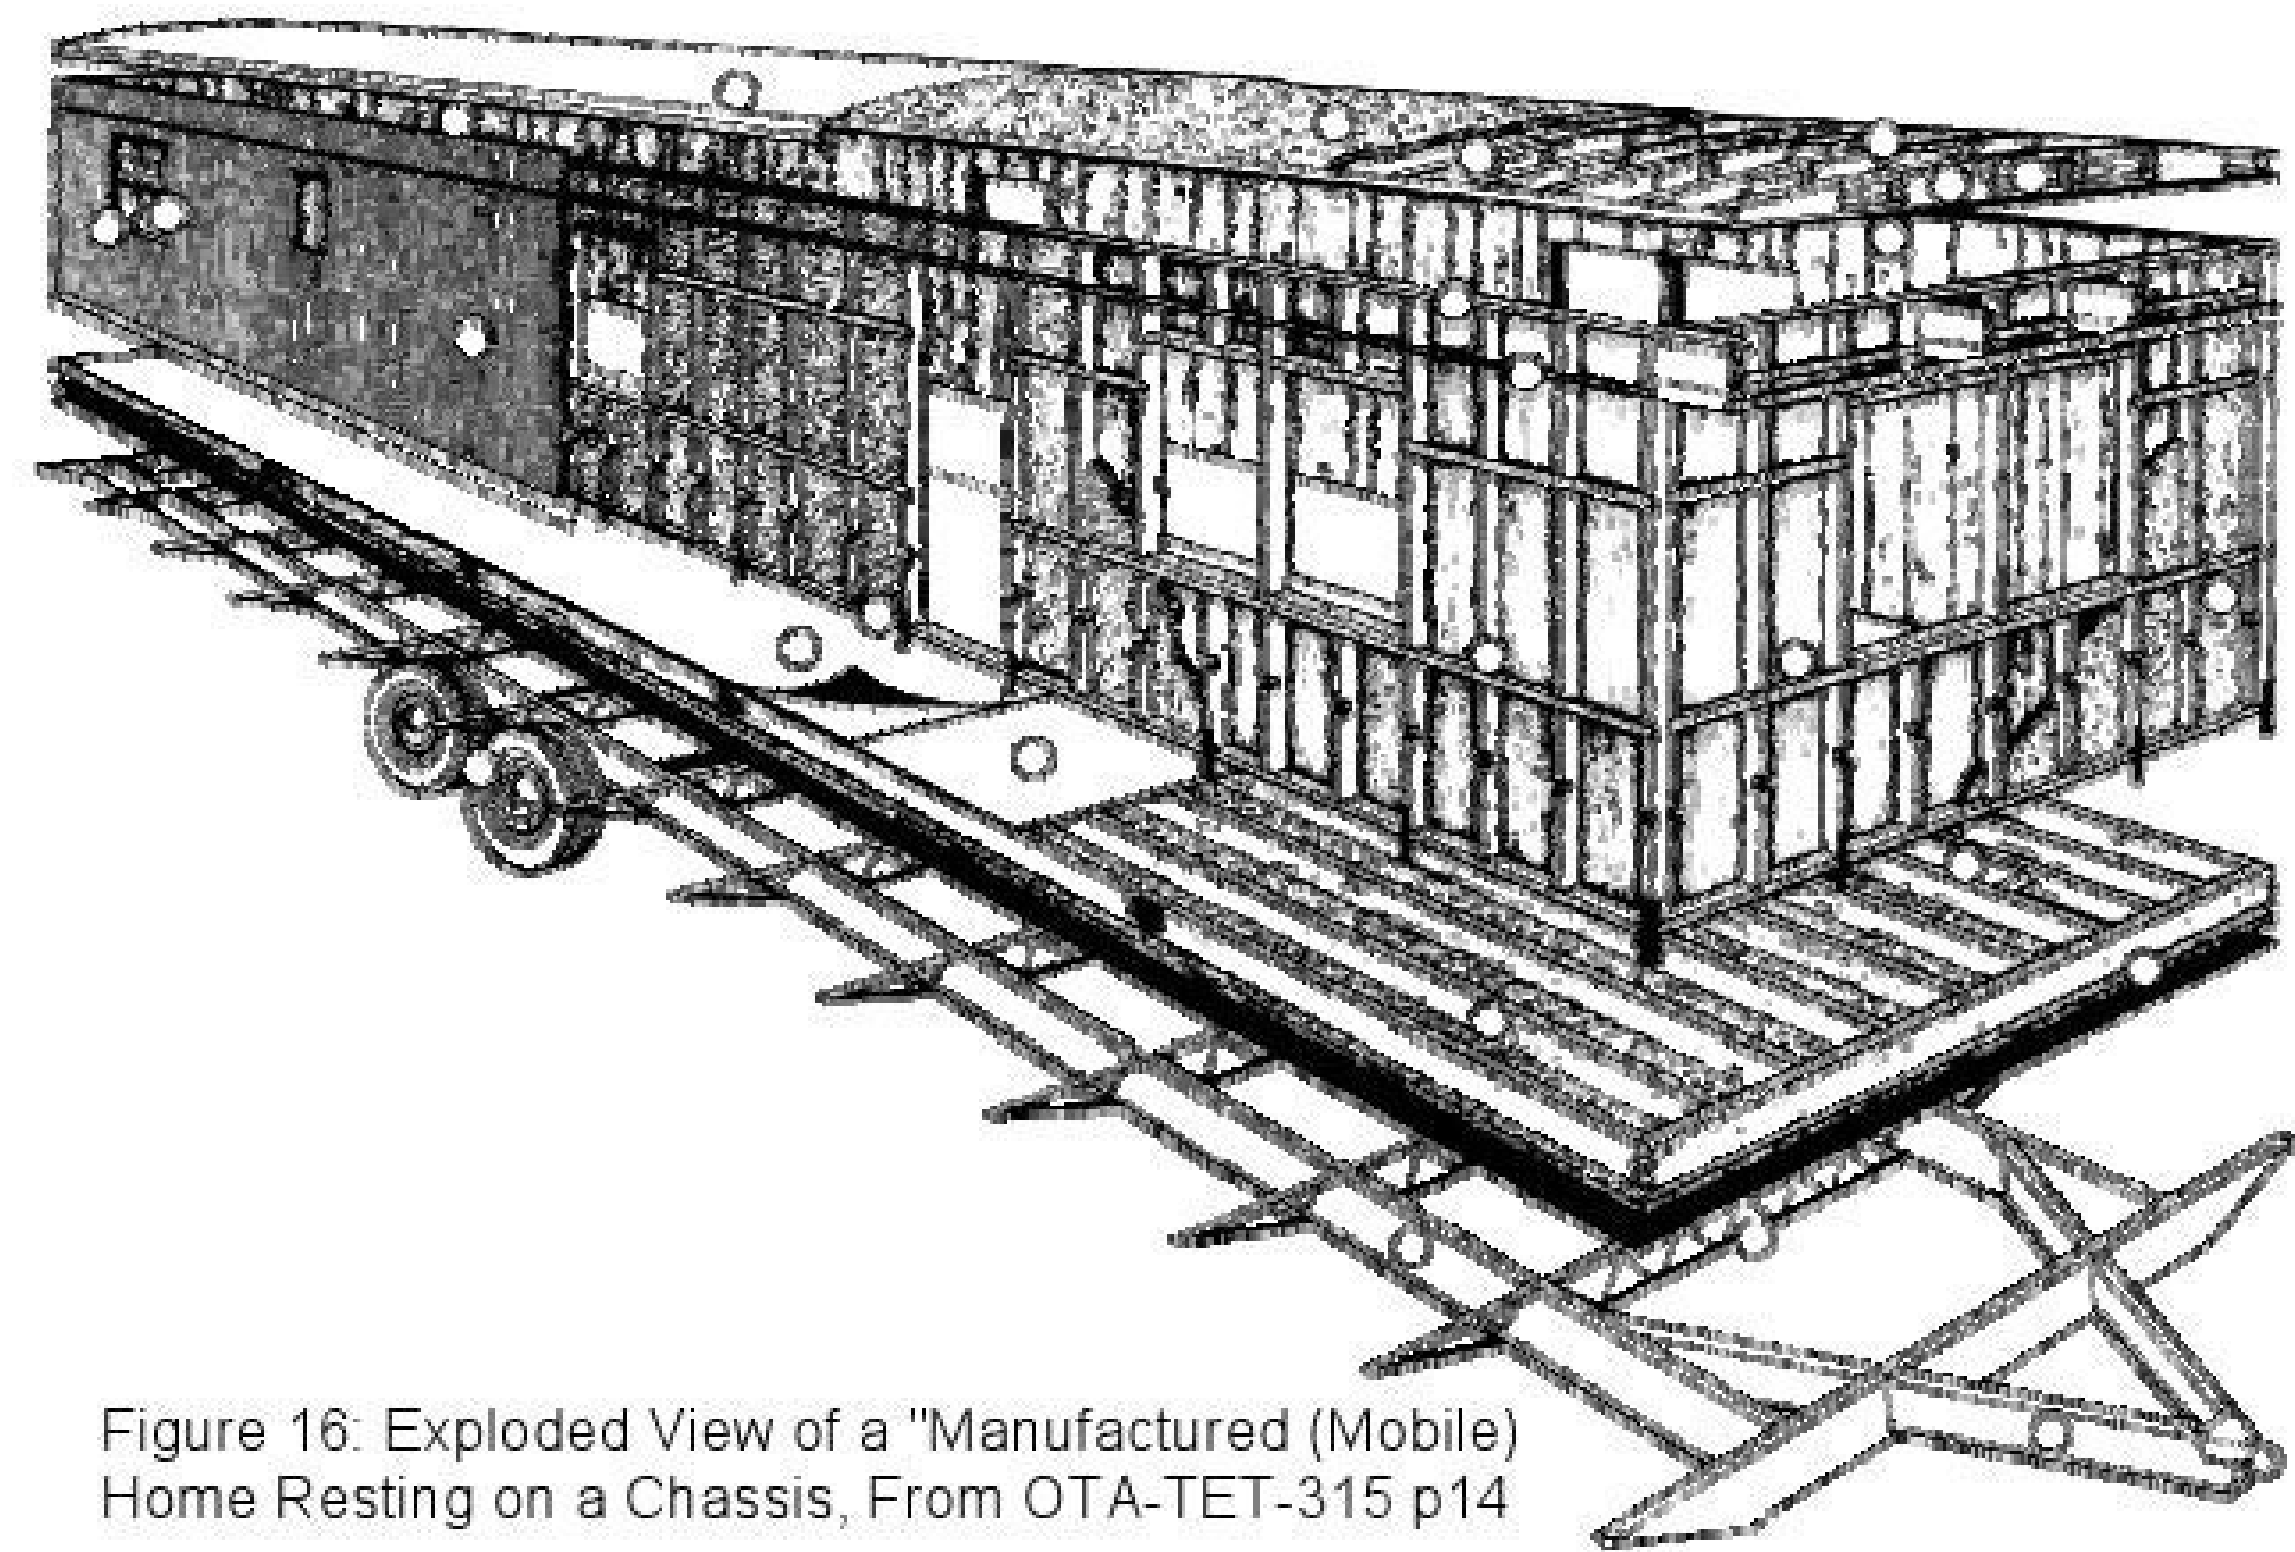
Exploded View of a "Manufactured (Mobile) Home Resting on a Chassis, From OTA-TET-315 p14
